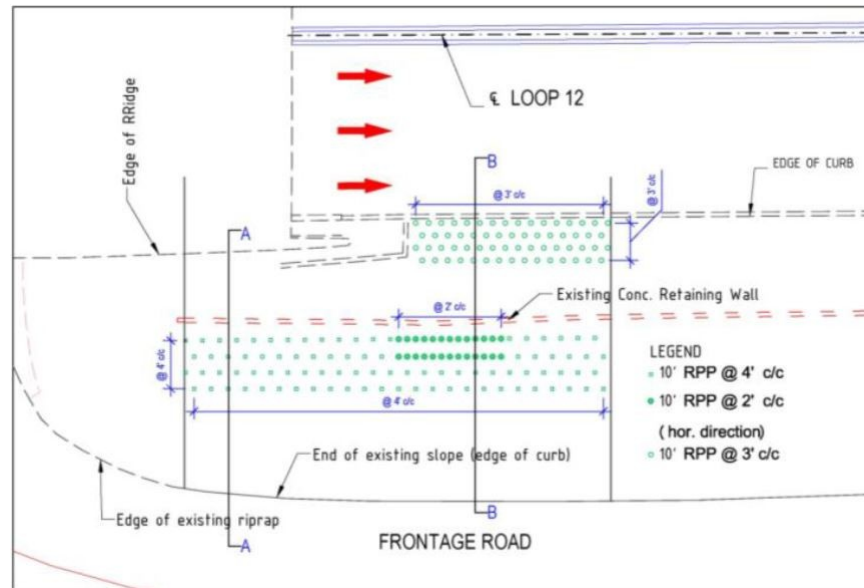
Layouts of stabilized sections of Loop 12 Highway (Khan, M. S., 2013).
